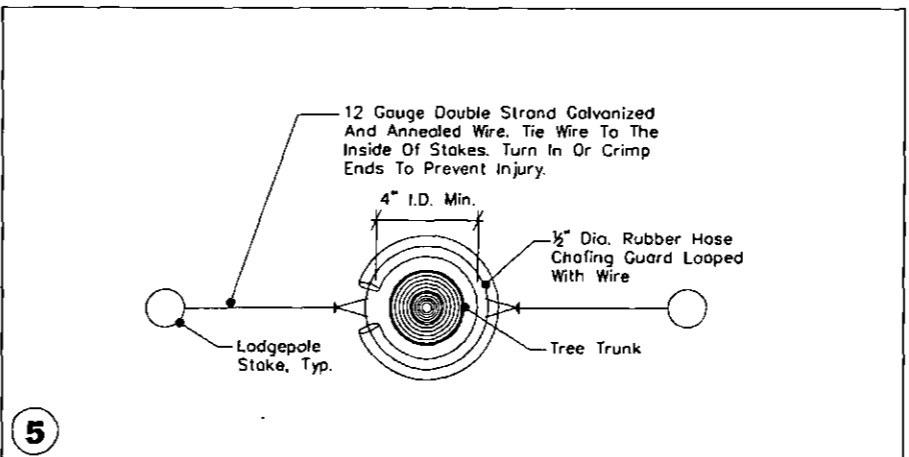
City of Scottsdale Standard Details
